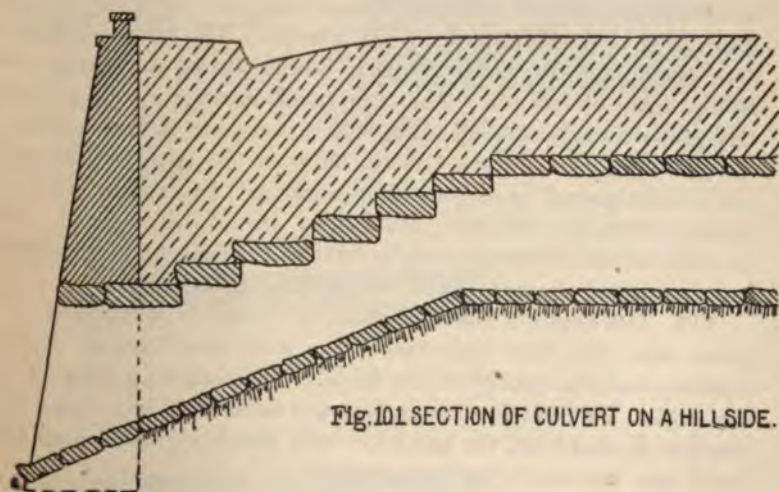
SECTION OF CULVERT ON A HILLSIDE.
